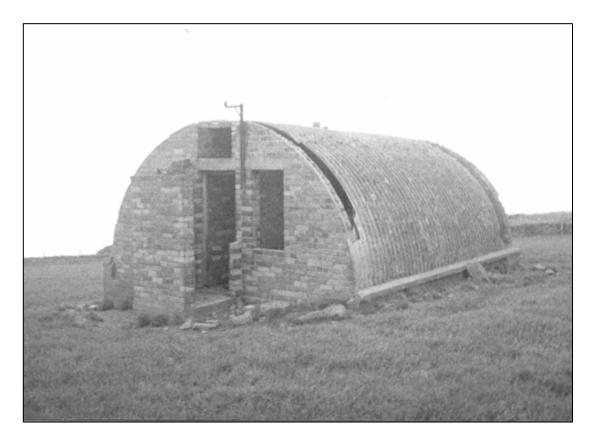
Building R3, looking SE (NT photo 100/8, February 1998).
